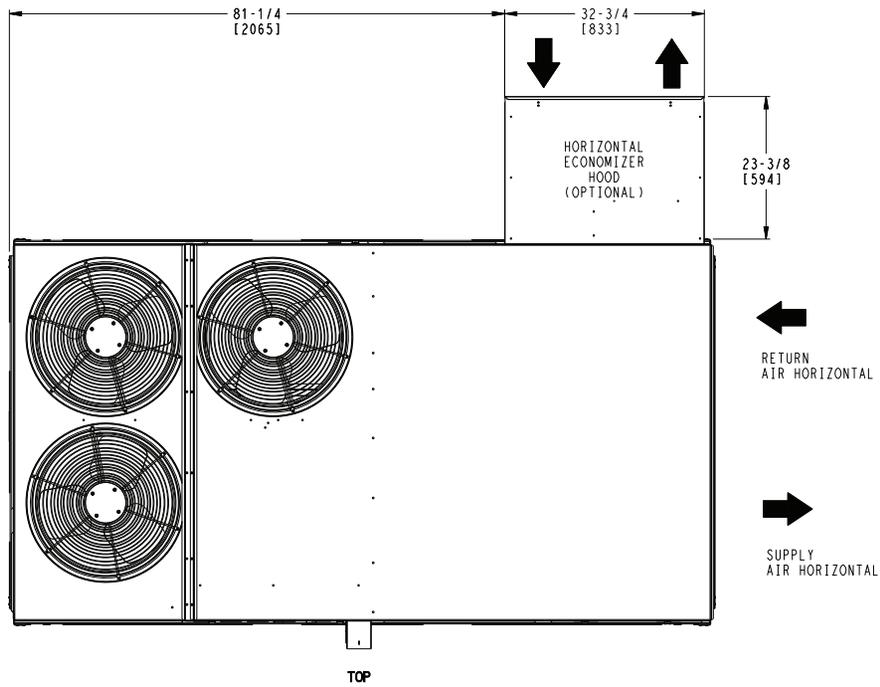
Unit Dimensional Drawing, Size 08, Single-Zone Electric Cooling with Gas Heat
